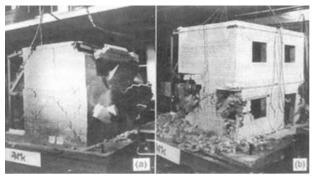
Failure mechanism of the masonry building models made of brick: a) Without wall ties; b) With wall ties [4].
